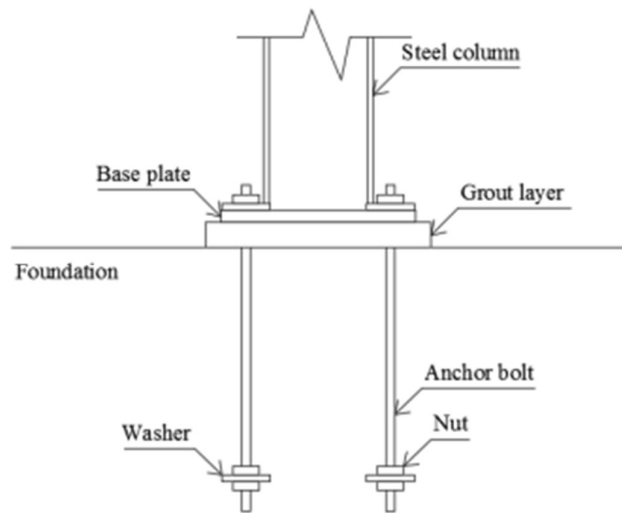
Main elements composing an exposed column base plate (Amaral, 2014)
